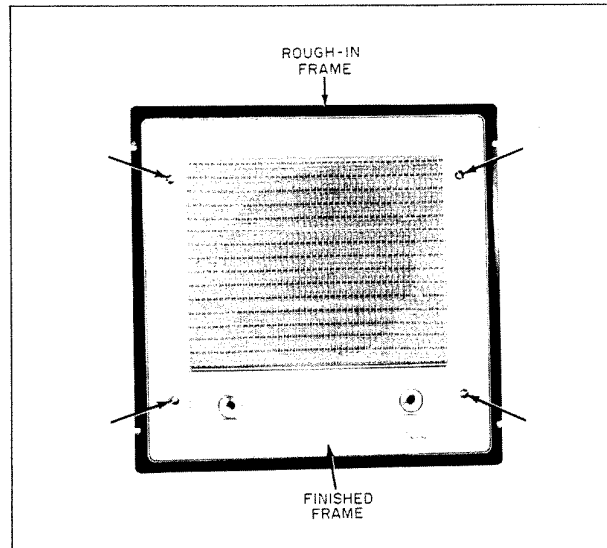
Finished frame assembly of outside-installed Model 200 remote speaker station.
